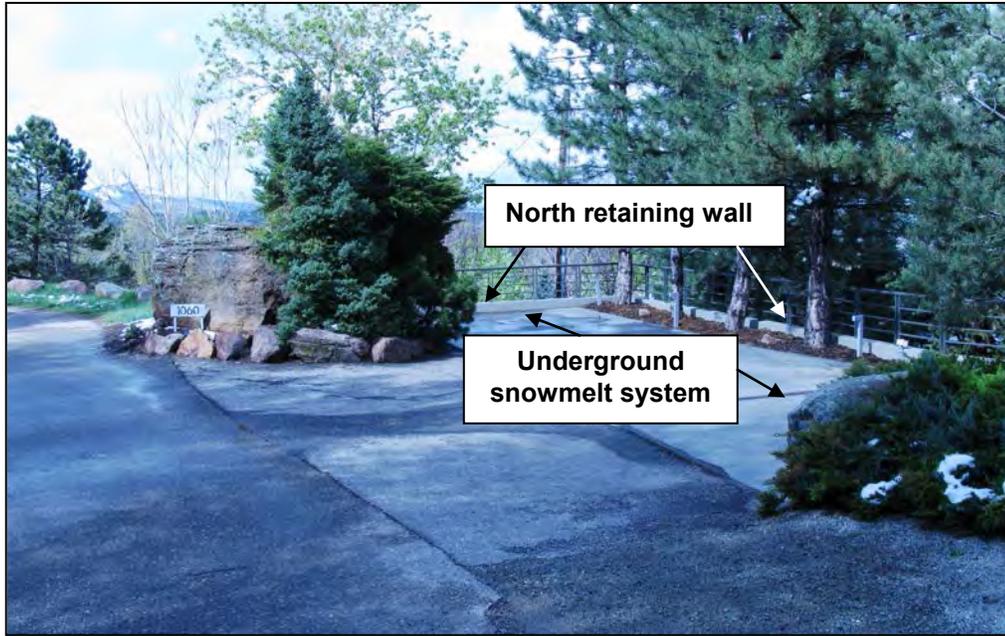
The north retaining wall and snowmelt system encroachments looking north
